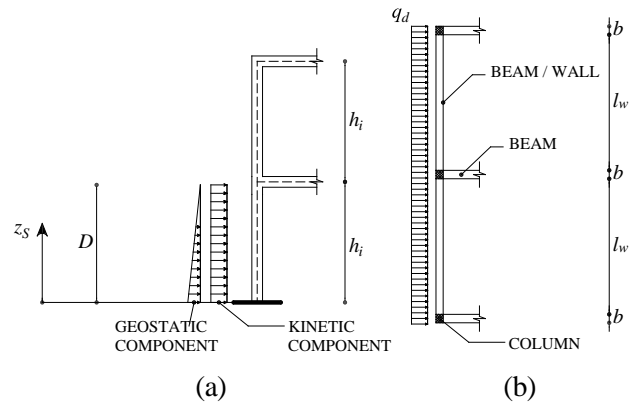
Impact load on building façade: (a) lateral view; (b) plan view.
